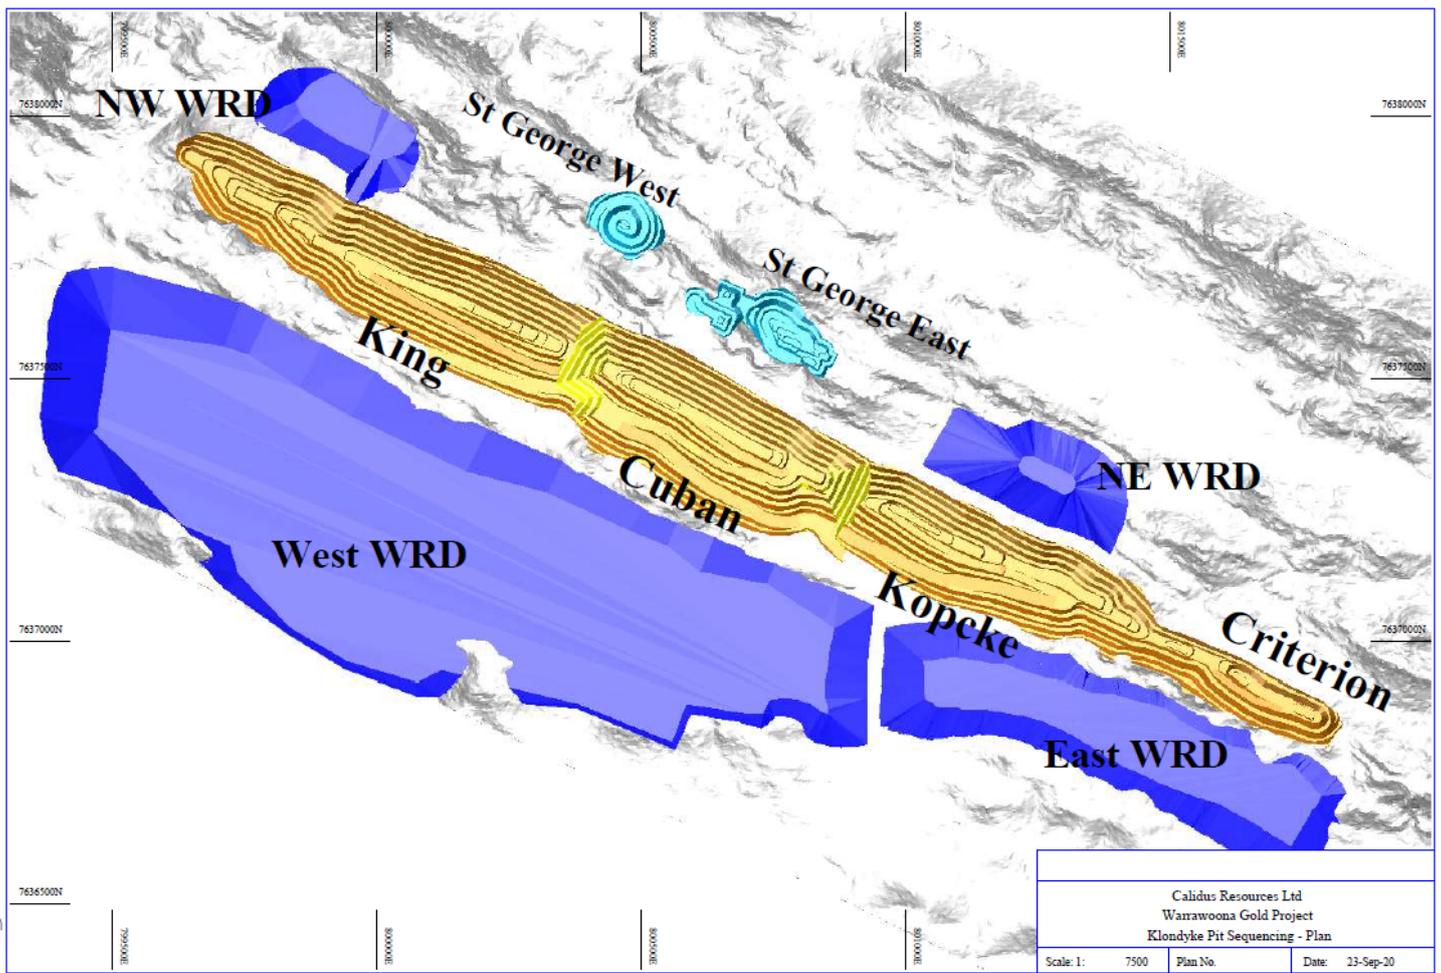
Final 2.4km Klondyke Open Pit and Waste Rock Dump Design
